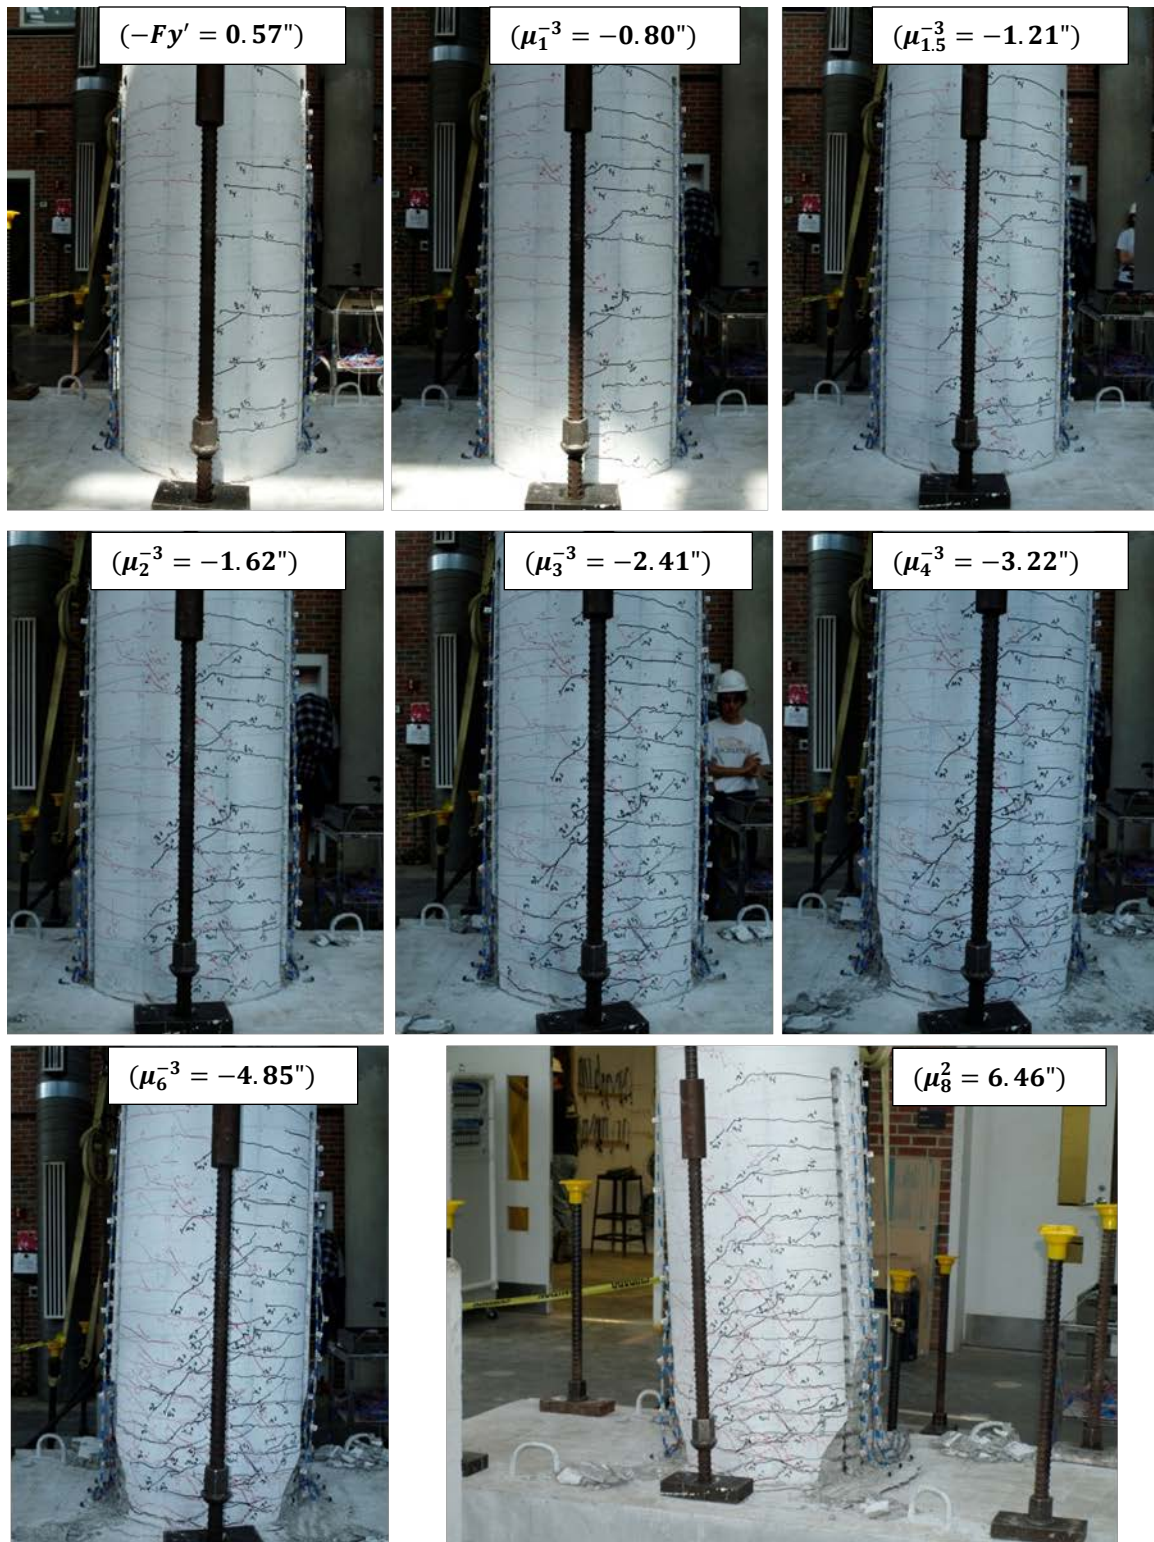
Test 13 – Crack Progression on the Back Side of the Specimen
